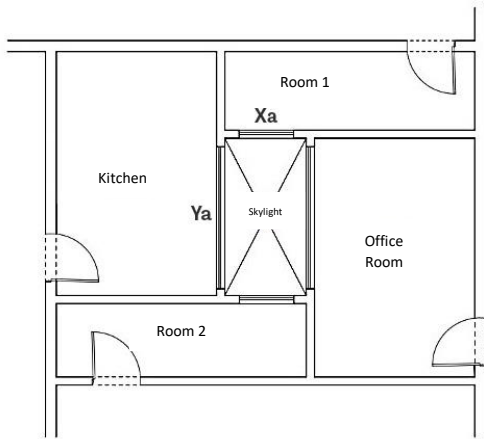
Partial plan sketch of building A (A Binasının Kısmi Planı)
